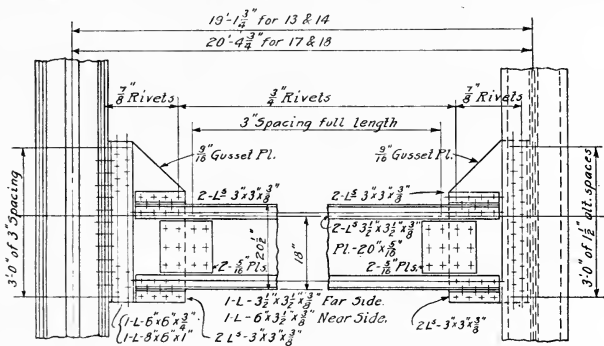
Spandrel Girder 13-14, 17-18, at Fourth, Fifth, and Sixth Floors
